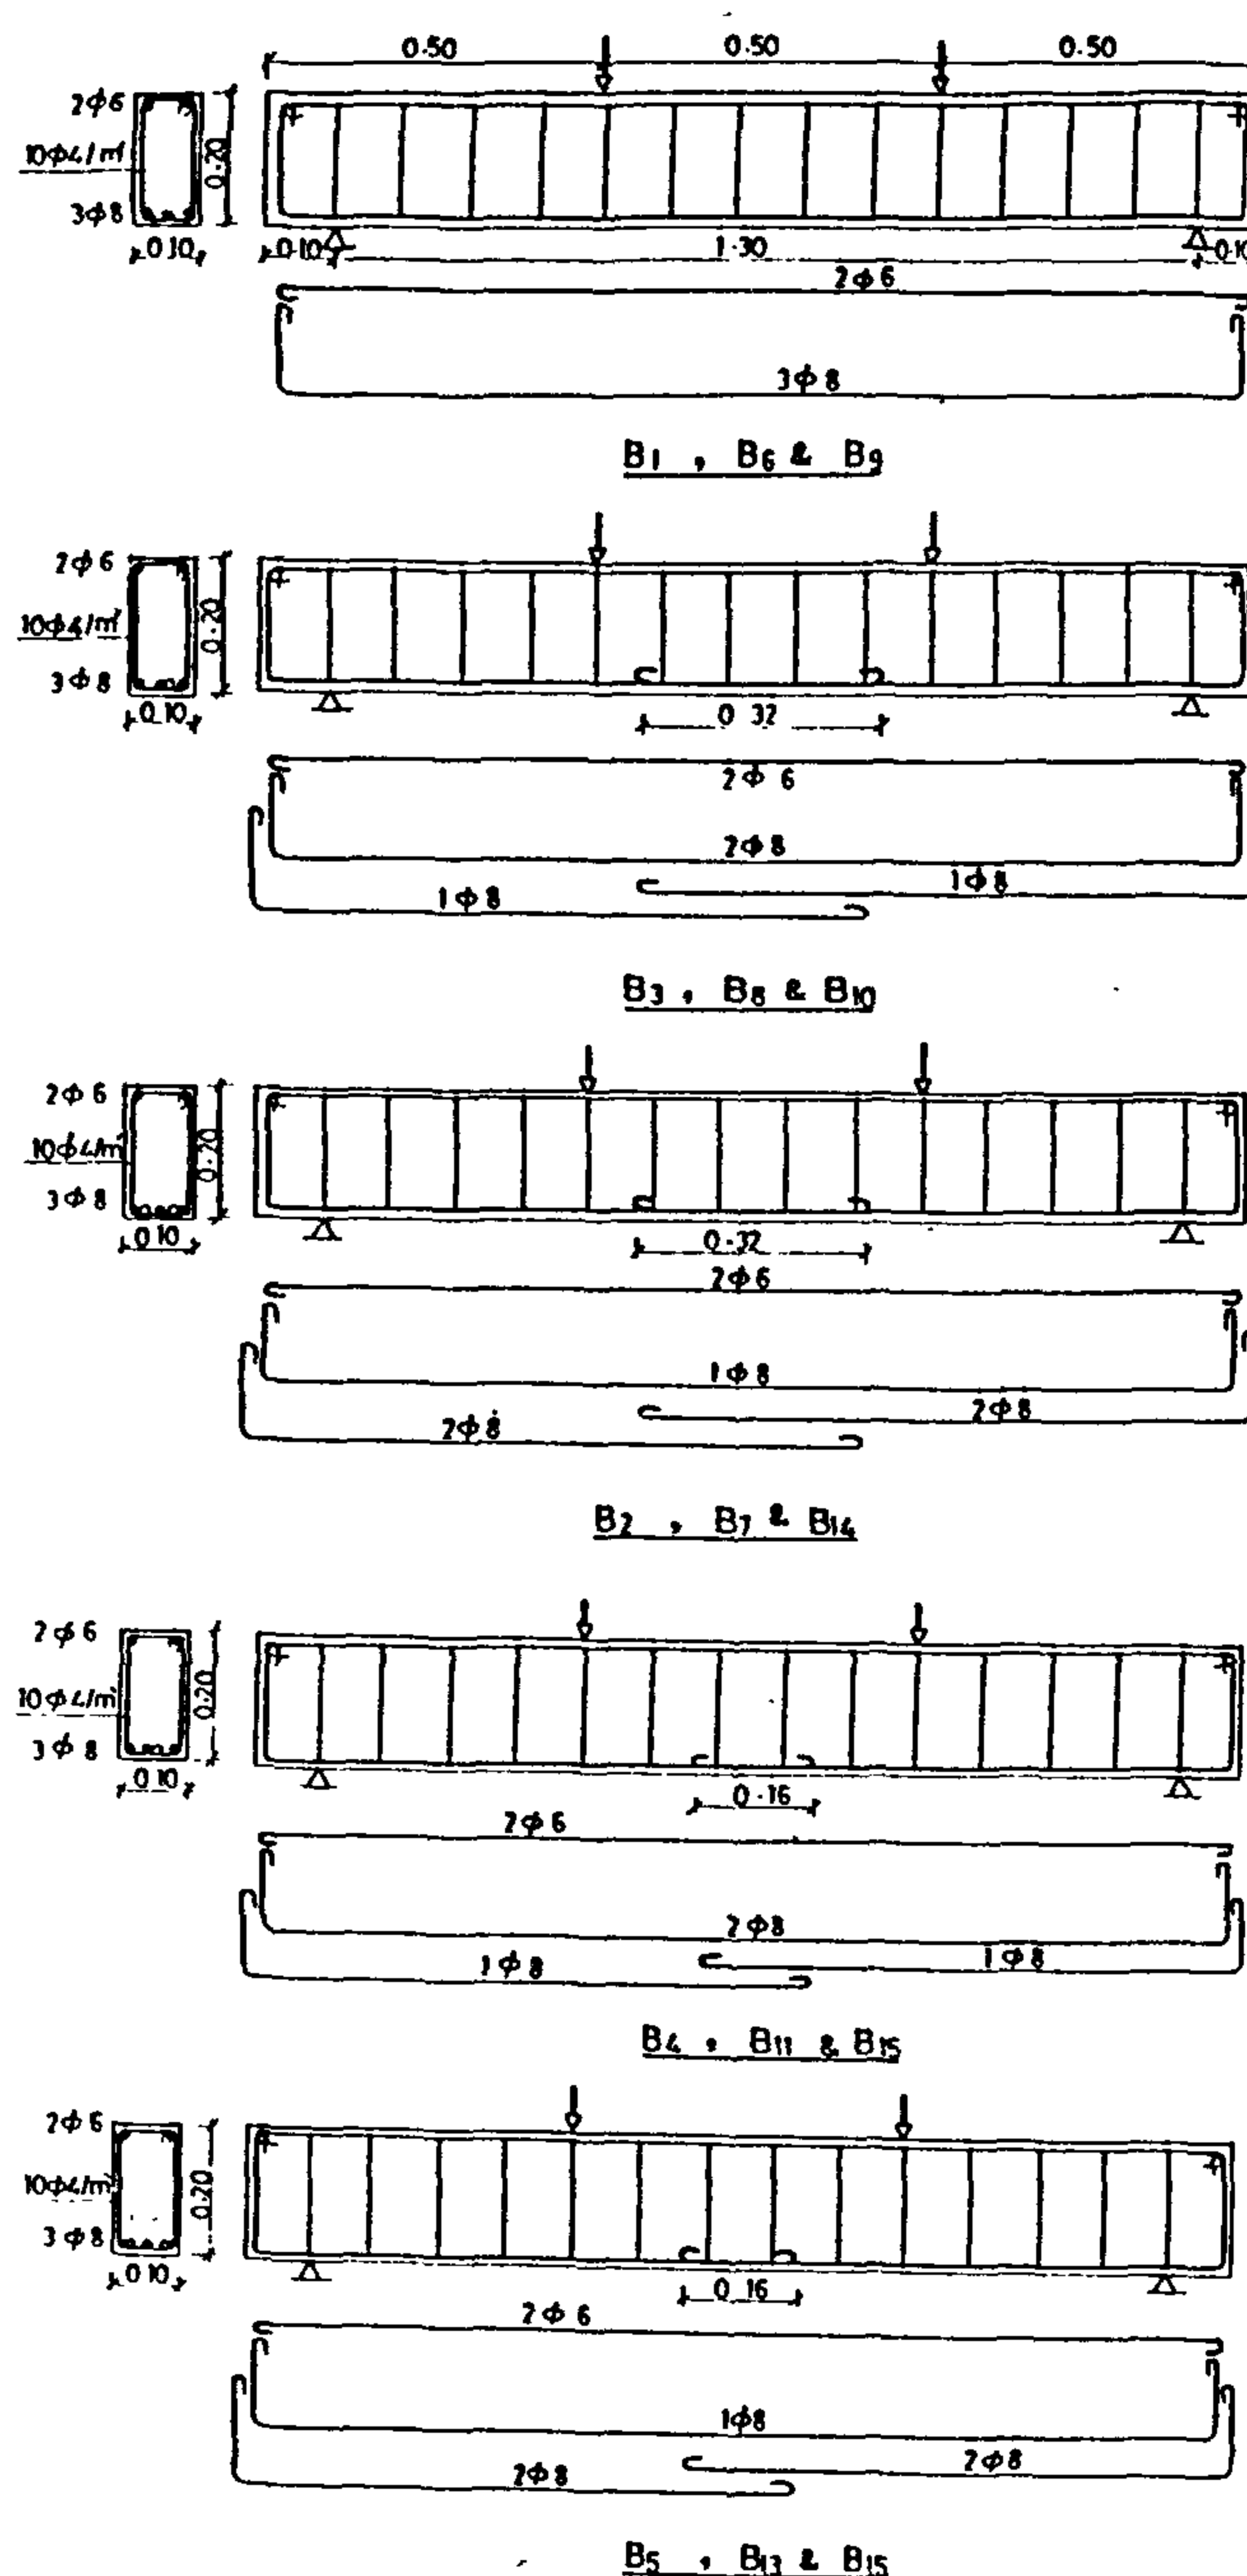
Detailing of the reinforcement for each group of tested beams
